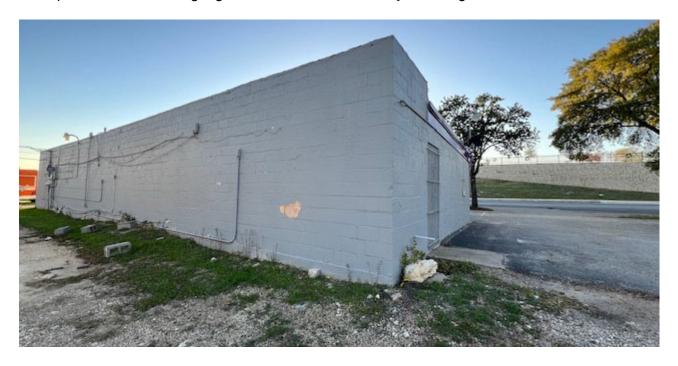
Street view of subject property showing the east elevation (rear). Note the windows at the rear are not original windows.
